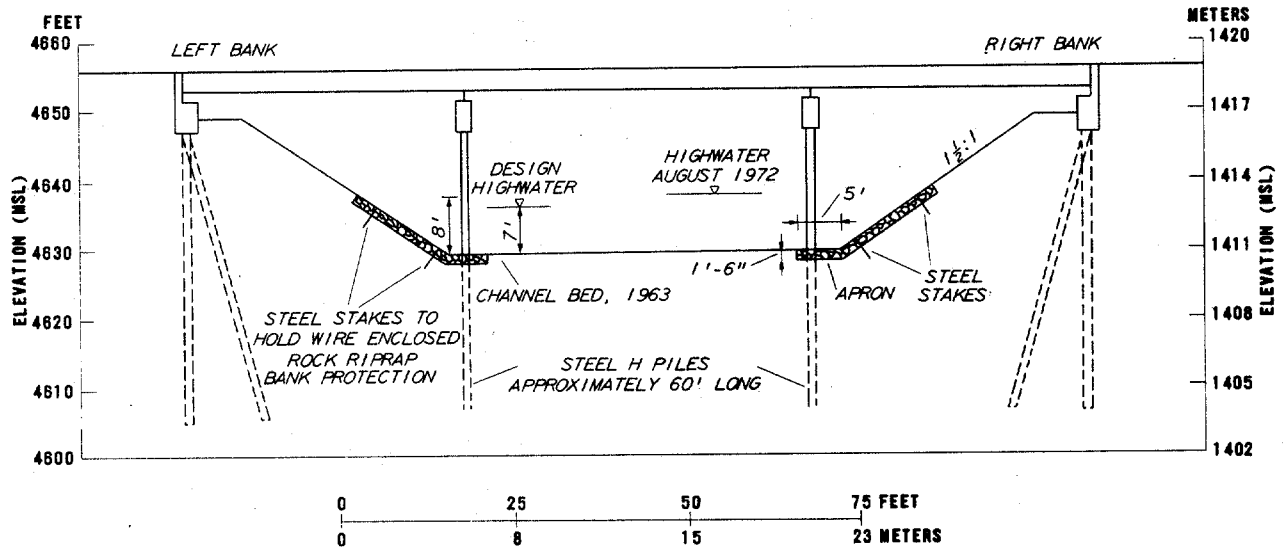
Cross section of upstream bridge across Walnut Creek at I-25 near San Antonio.
